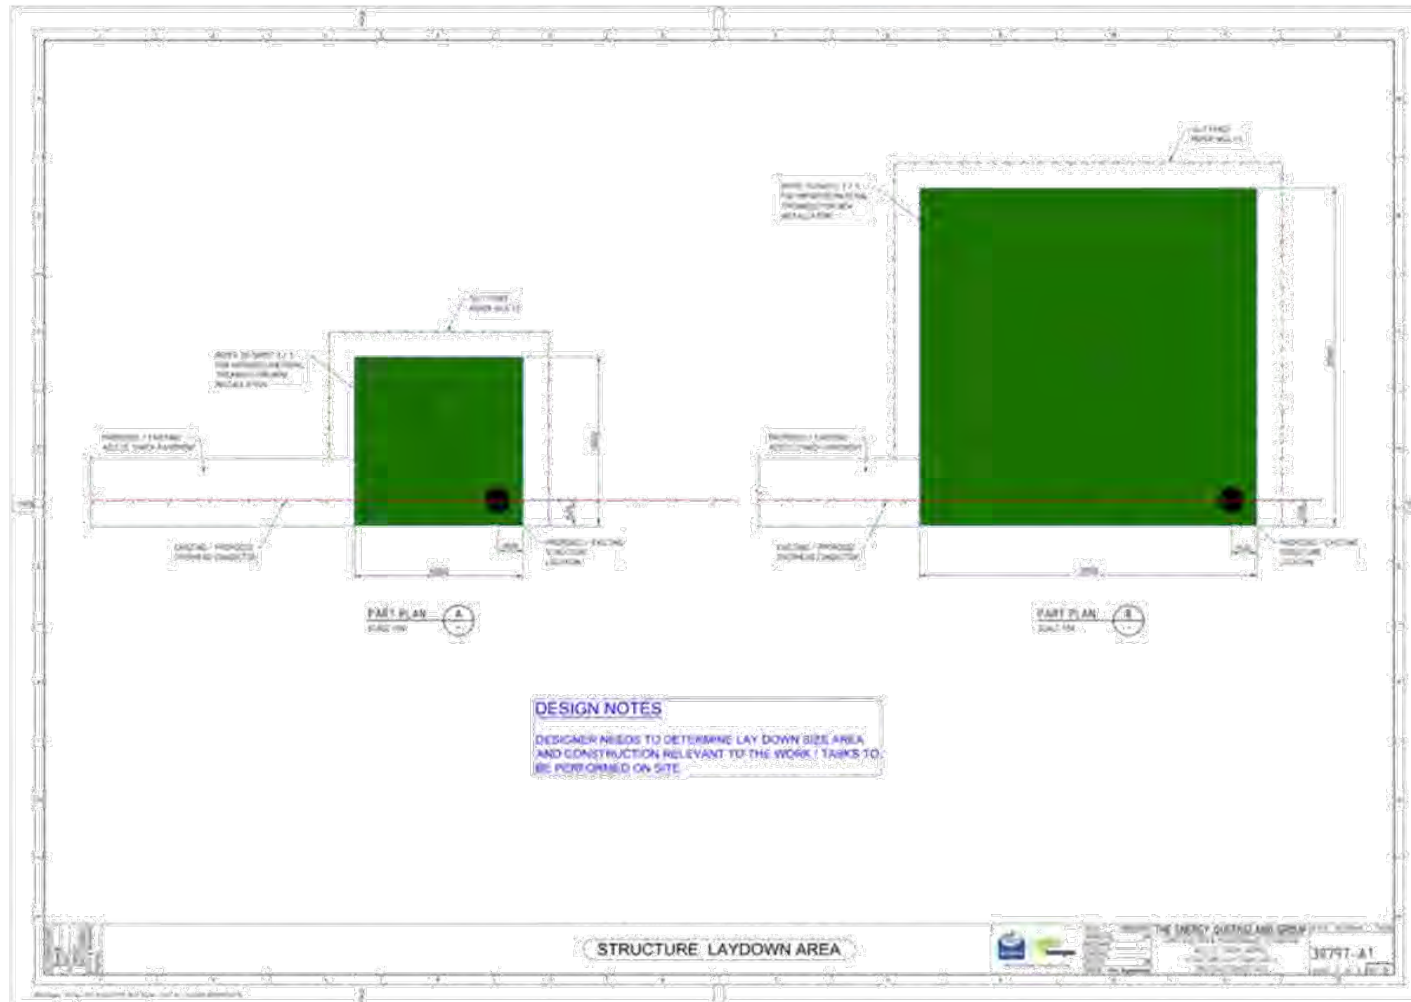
Access Track Infrastructure – Structure Laydown Area - Details
